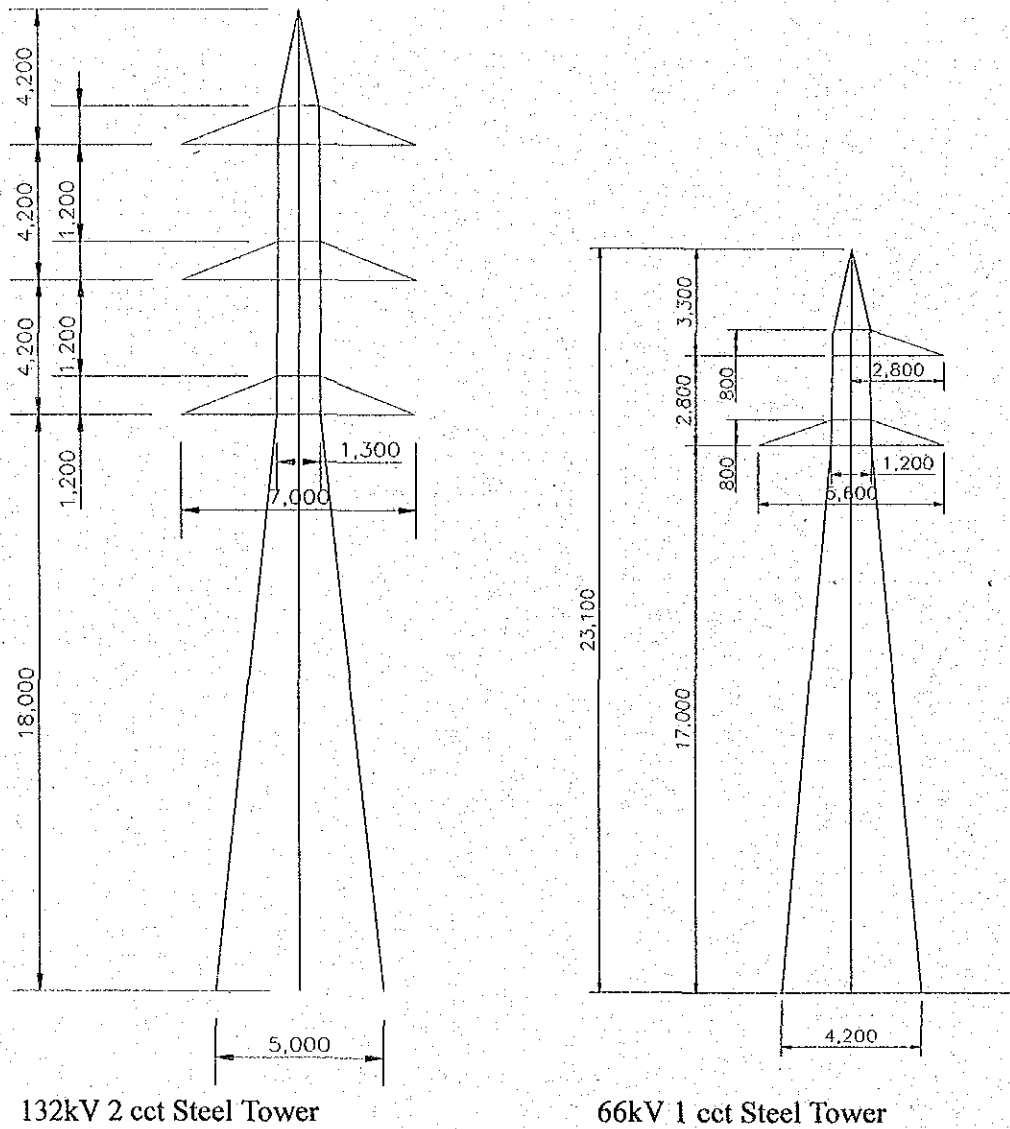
Typical Design of 132kV and 66kV Steel Towers
